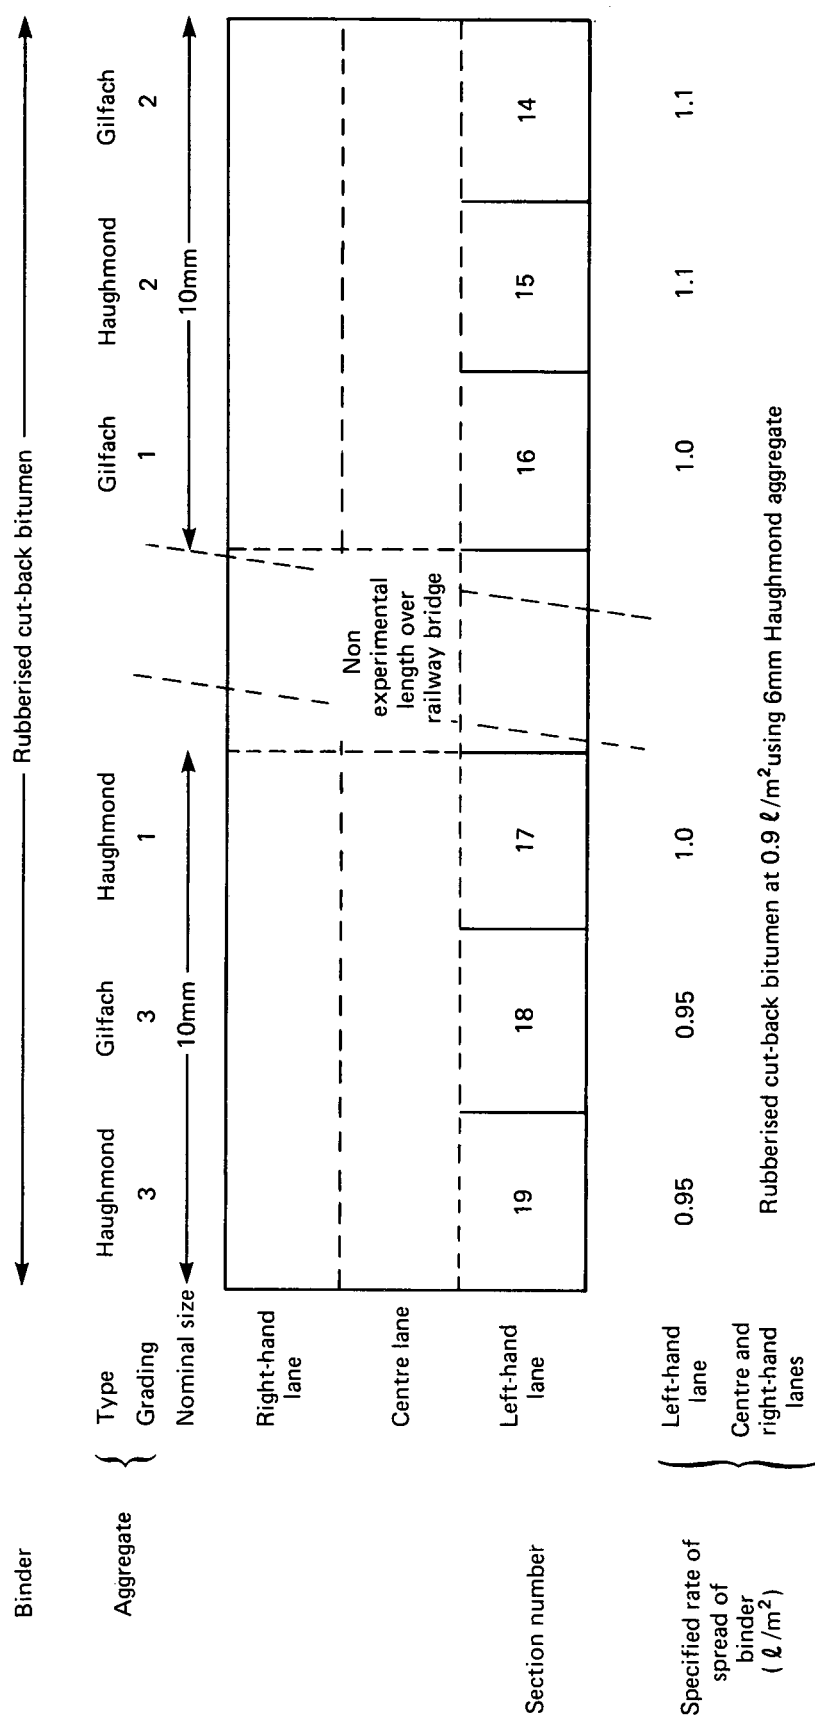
LAYOUT AND COMPOSITION OF EXPERIMENTAL SECTIONS (LONDON-BOUND CARRIAGEWAY)
